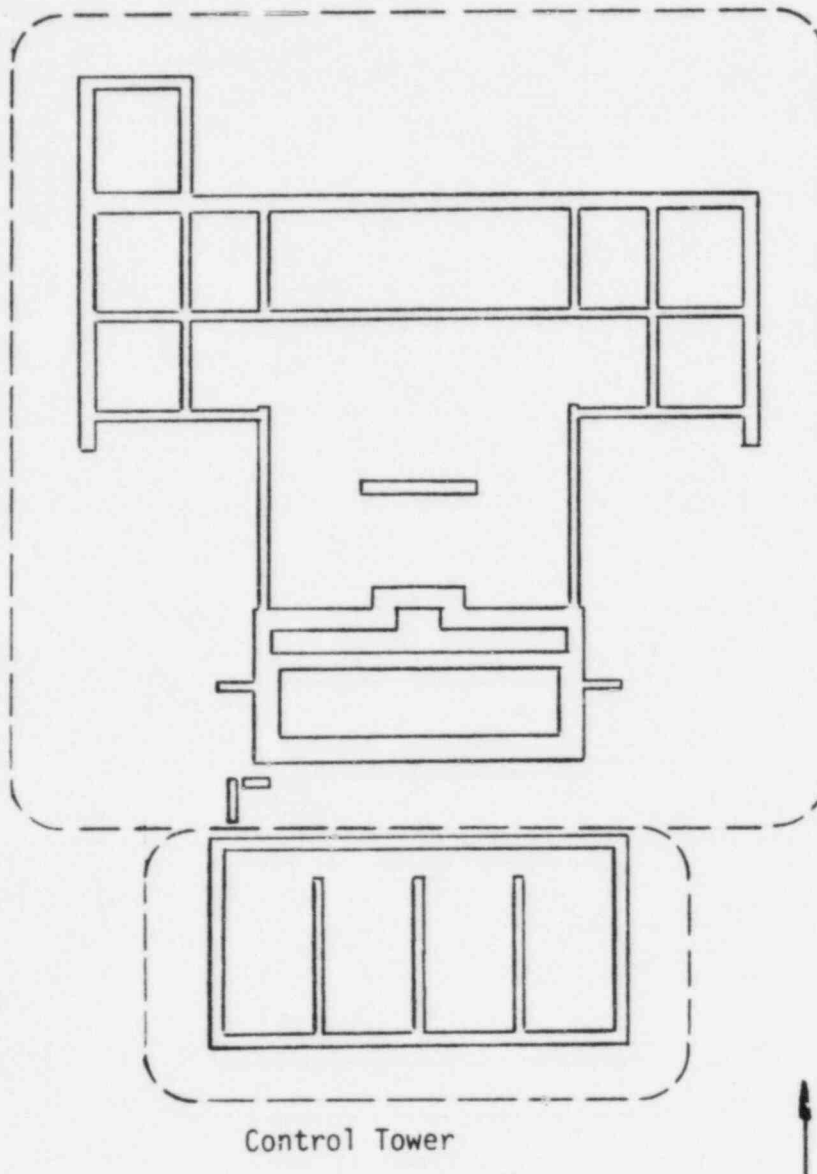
IDEALIZED LAYOUT OF WALLS FROM ELEVATION 614'-0" TO ELEVATION 634'-6" INCLUDED IN LOAD DISTRIBUTIONS
